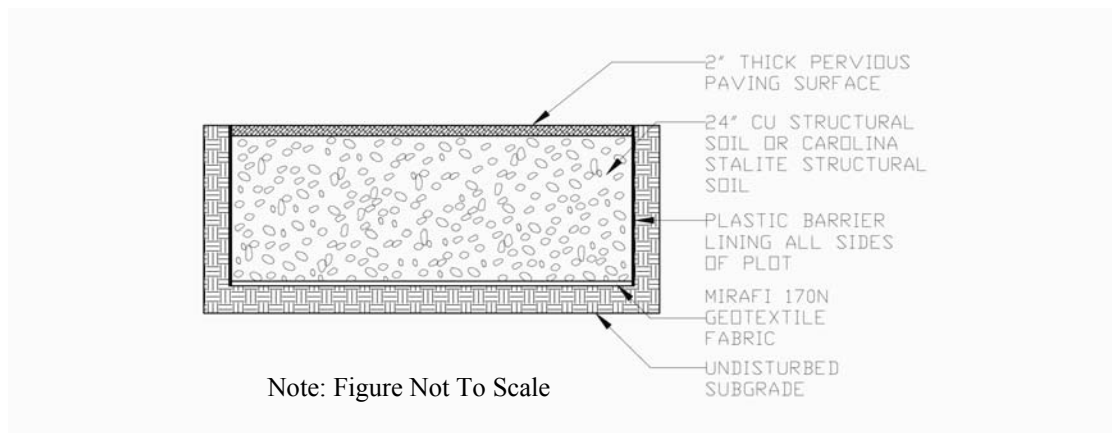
CU Structural Soil®/Carolina Stalite Structural Soil Detail
